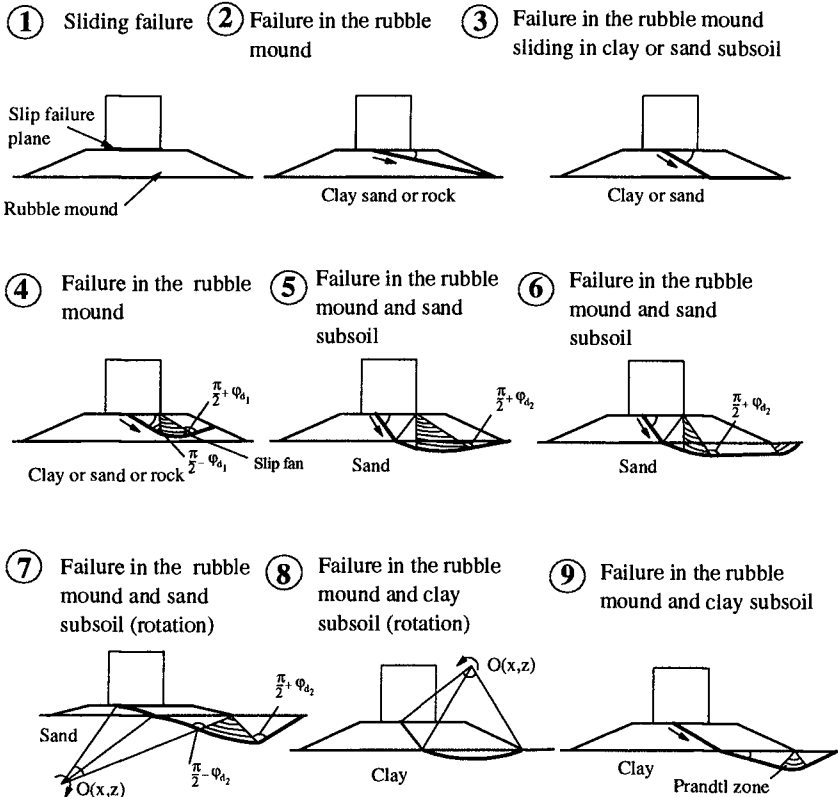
Nine foundation rupture failure mechanisms
